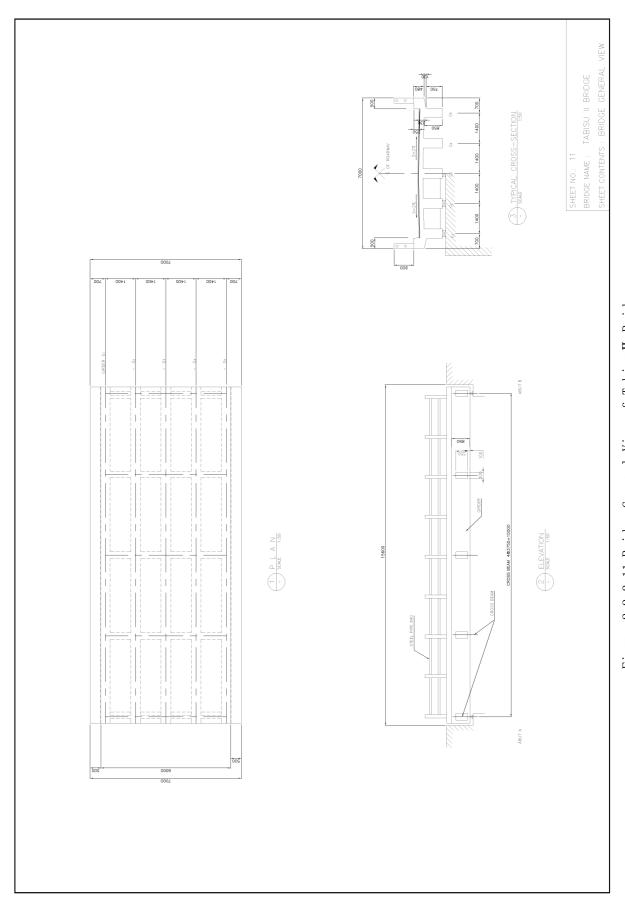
Bridge General View of Tabisu $\rm I\hspace{-.1em}I$ Bridge
